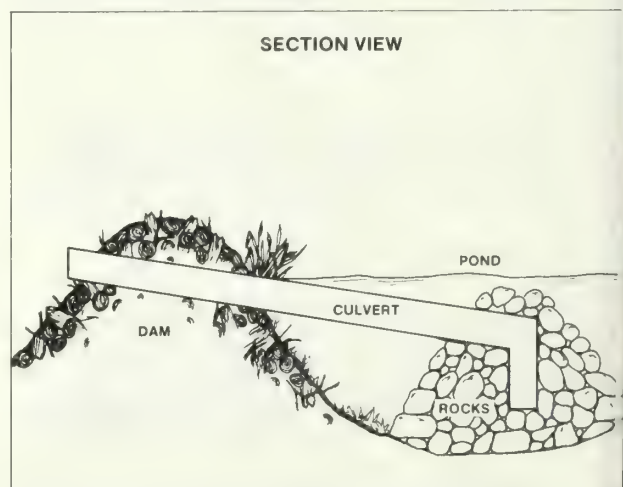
A proposed culvert treatment for reducing problems with beaver.
